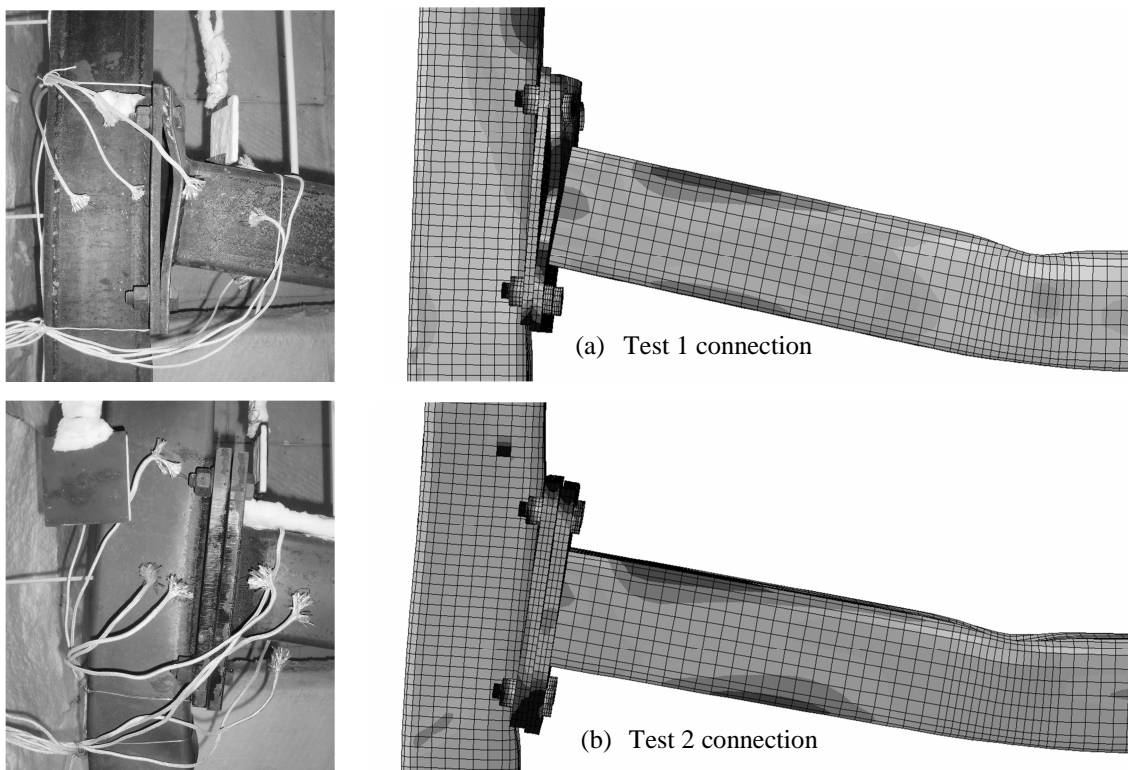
Beam-to-column connections' deformations after exposed to elevated temperatures
